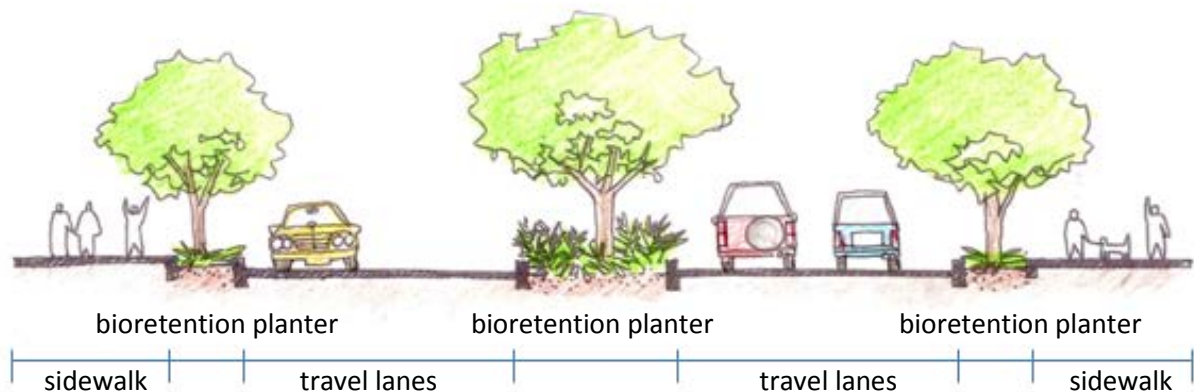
Cross-section illustrating the street bioretention planter at the street median and sidewalk
